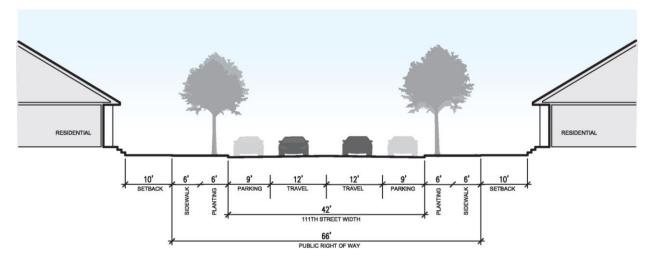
Typical section along 111th Street on the 300 West block between Princeton Avenue and Stewart Avenue
